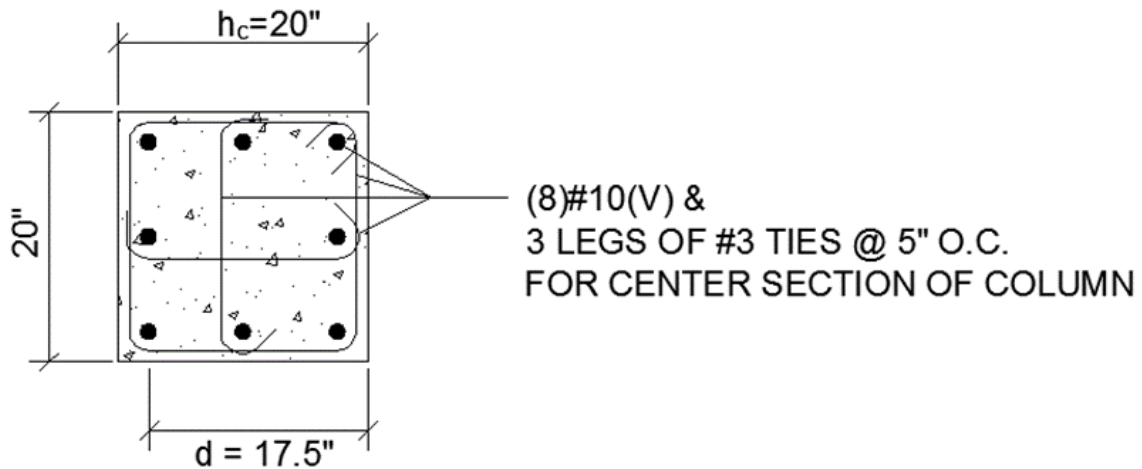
Exterior column, cross-section at center of column at the 2nd floor level based on tsunami design requirements.
